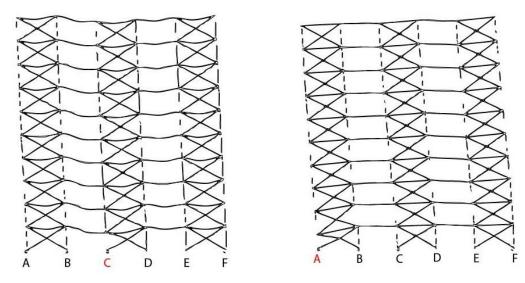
Deformed shapes for X-braced frame system after the removal of column (case C and case A)
